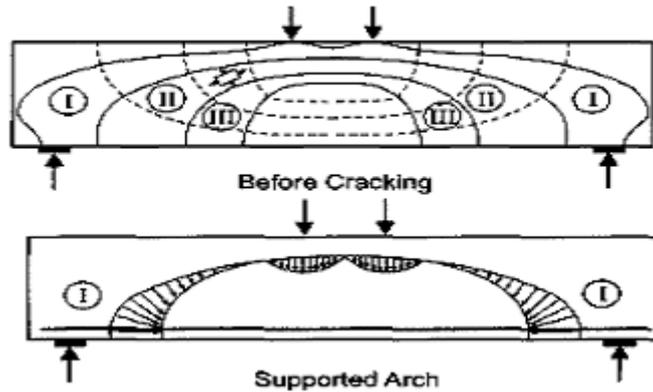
Forces acting in a beam element within the shear span and internal arches in a RC beam (Kani, 1964., Russo et al., 2004).
